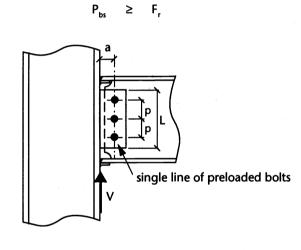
Preloaded ("HSFG") bolts to fin plate
